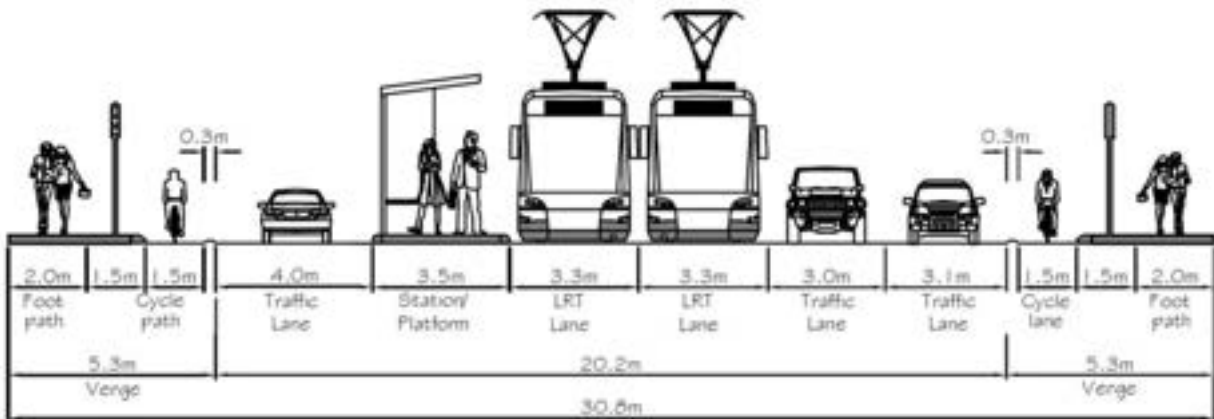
Indicative intersection treatment at light rail station (concept only)
